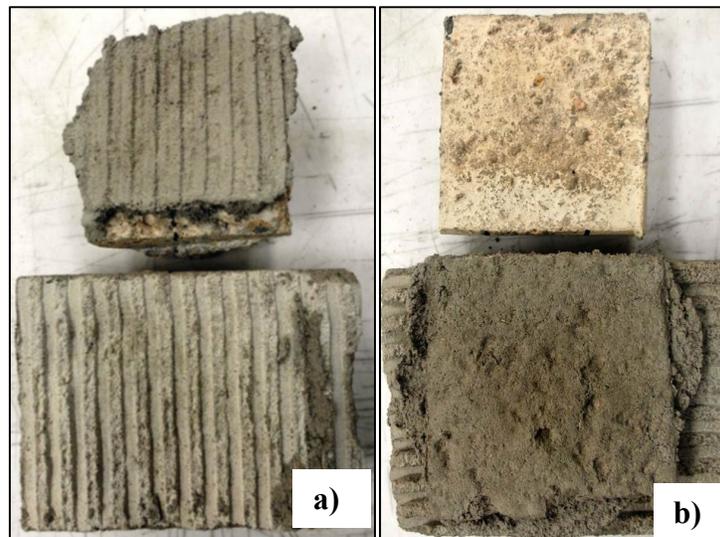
a) Shear Bond Test Set-up b) Tensile Bond Test Set-up.
